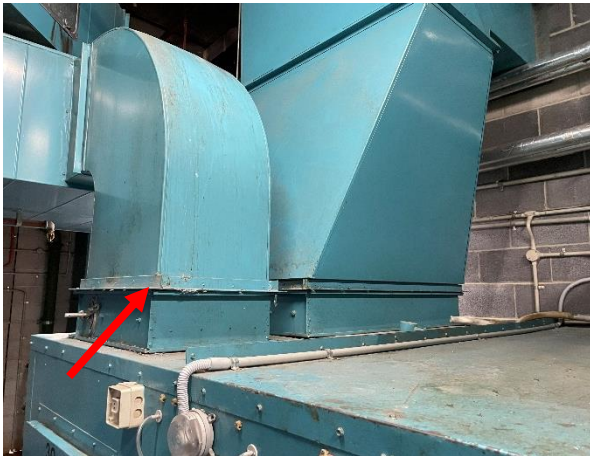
Main Warehouse – asbestos containing grey mastic to fire dampeners in air handling unit within administration plant room
